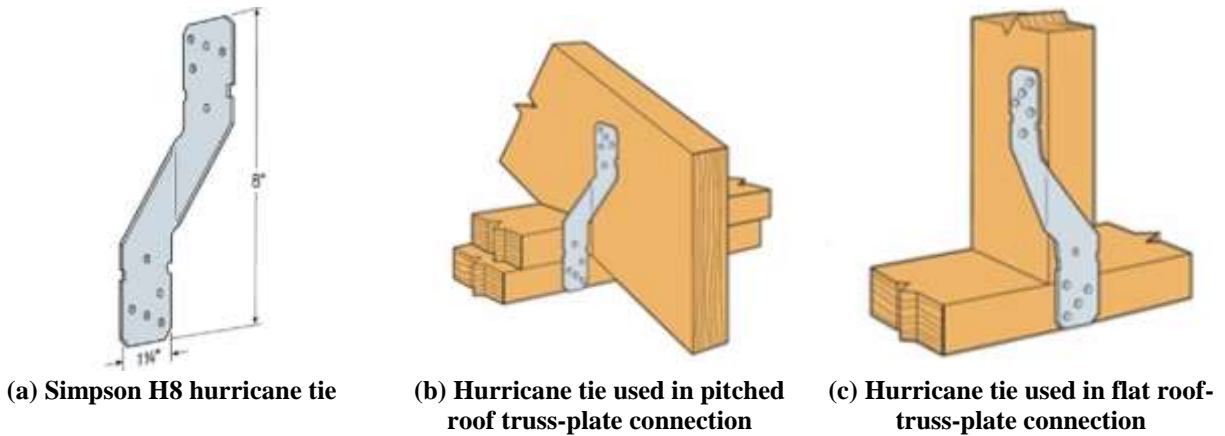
Hurricane ties used at the truss-wall connection (Fasteners Plus 2018)
